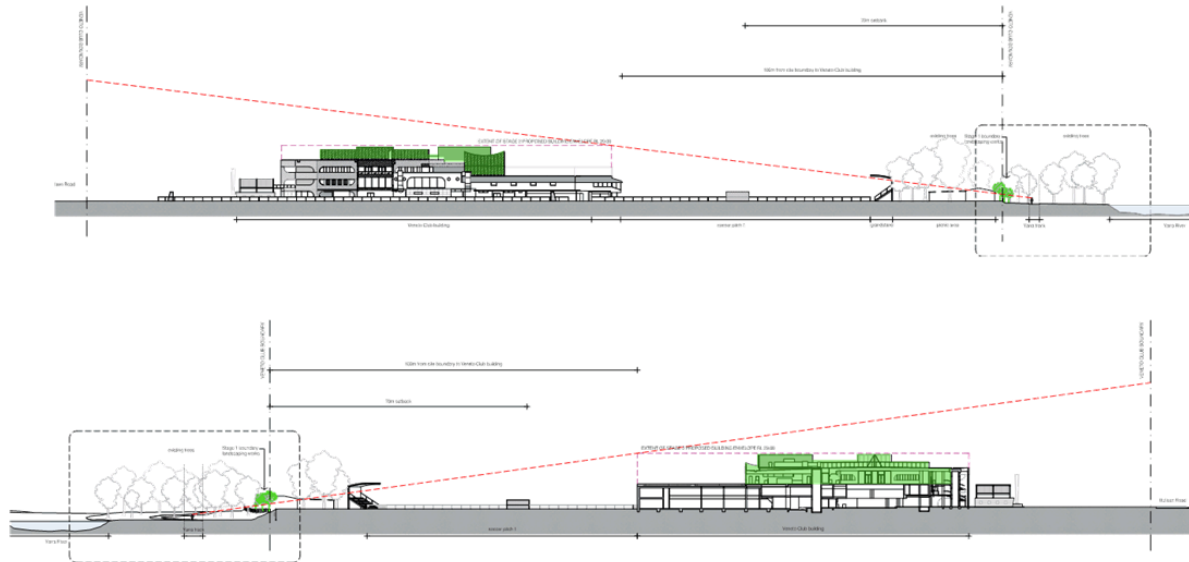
Proposed Site Sections showing view lines from Yarra Trail and Stage 2 Envelope dashed (Stage 1 works in green)
